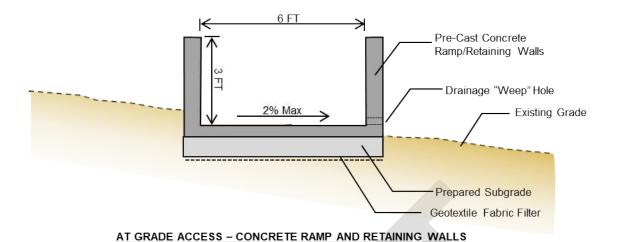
At Grade Access – Concrete Ramp and Retaining Walls Schematic
